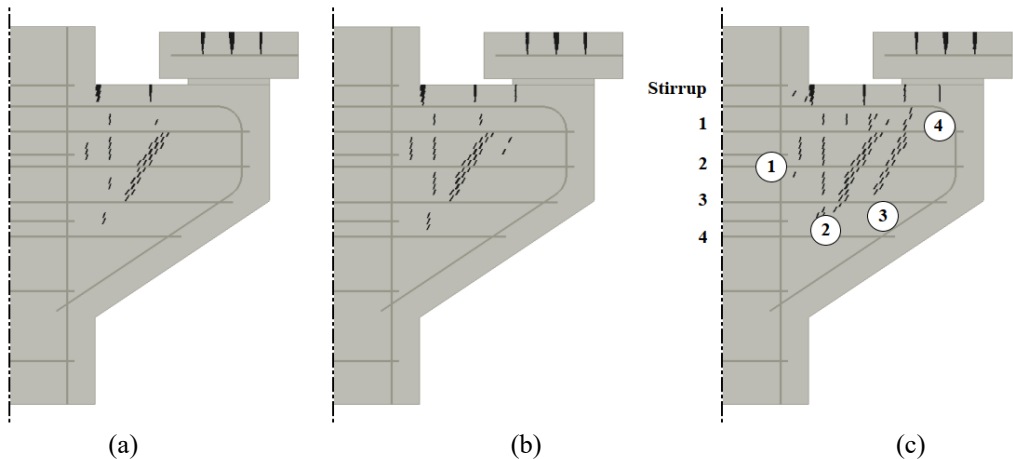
Crack model showing crack with a minimum width of 0.05 at a horizontal load of 10 kN, 30 kN, and 60 kN.
